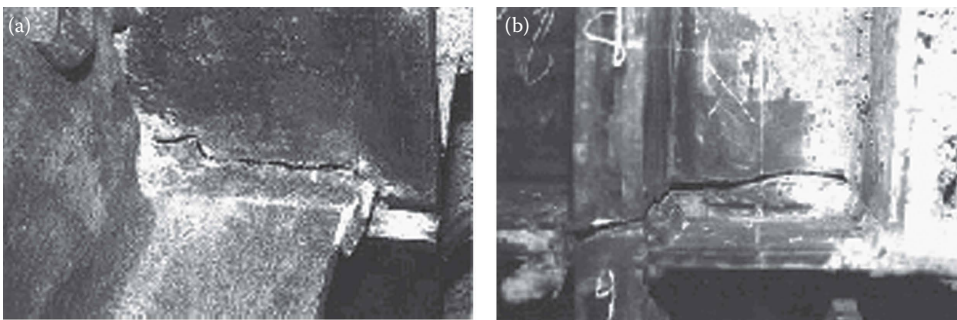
Examples of typical damage in connections of moment frames: (a) weld fracture at bottom flange; (b) fracture extending into structural section.
